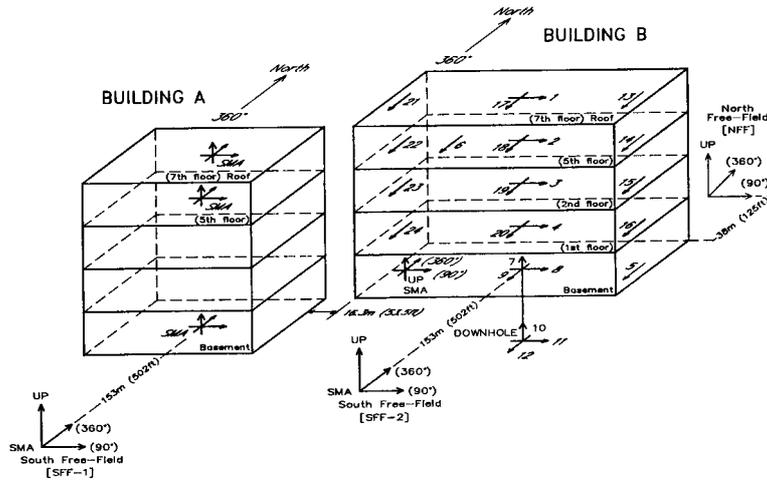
Instrumentation of the two buildings and the site at 12400 block of Imperil Highway, Norwalk, Ca. In this study, Building B (NOR) and the south free-field (SFF) is considered.
